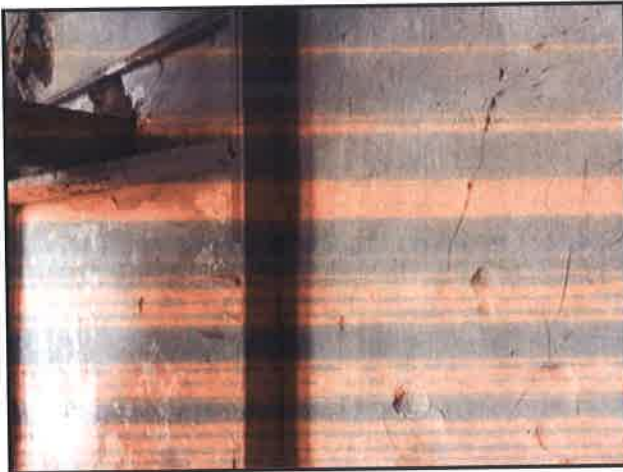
Duct Insulation(AHU) 7th Floor (Close-up)
